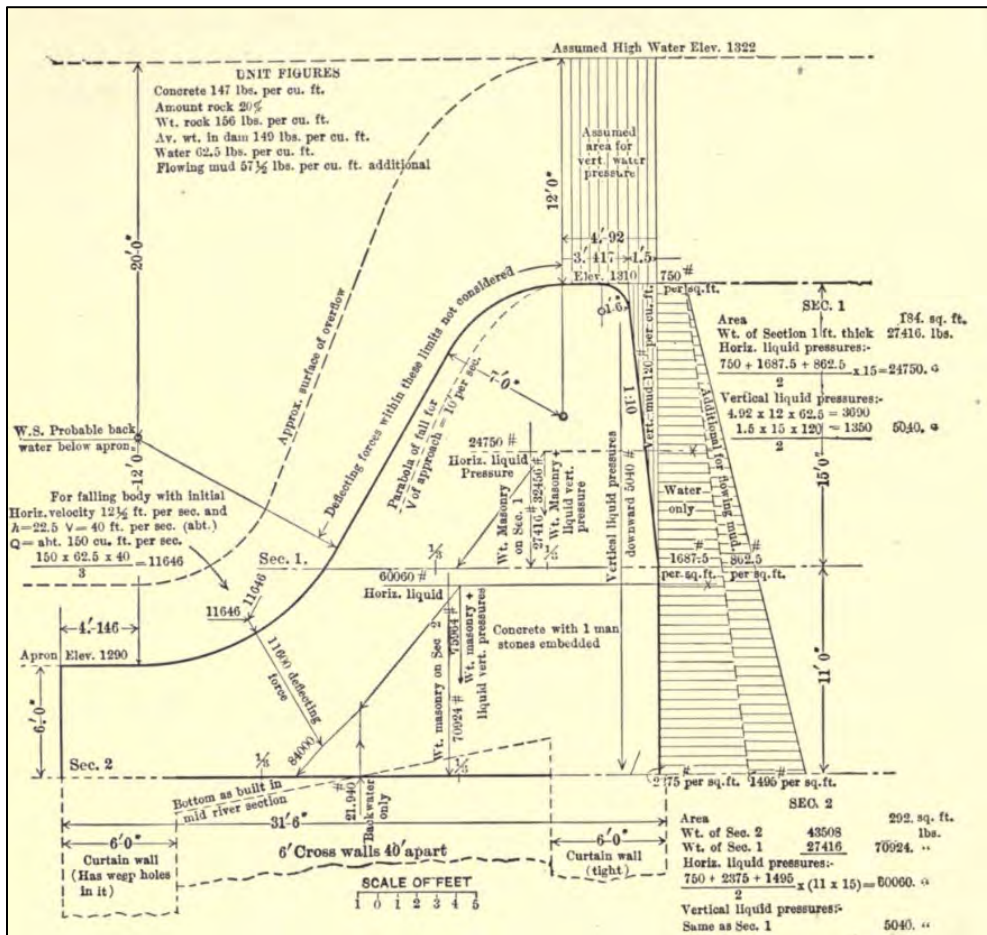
The drawing shows the construction of the Granite Reef Diversion Dam (Arizona), a concrete rubble construction style.¹⁹⁶
